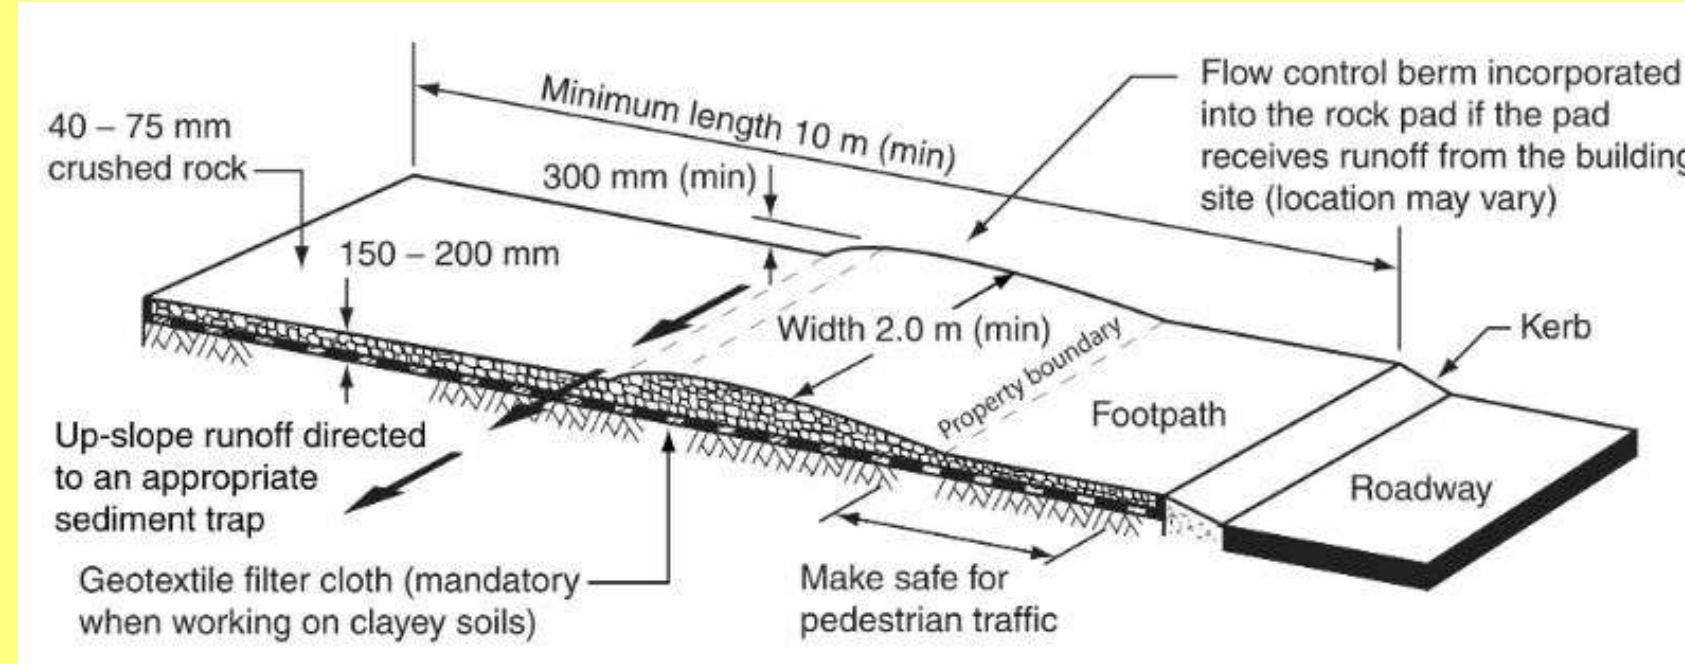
Dimensions and construction details for rock entry/exit pad for small building sites. For large construction sites the minimum length of stabilised site access structures is 15 metres, and a minimum width of 3 metres. Figure from Catchments and Creeks Pty Ltd.
